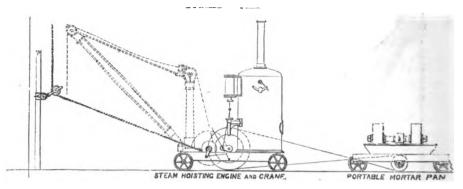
Elevation of No. 13 HOISTING ENGINE (or STEAM CRANE) with Patent Frictional Gearing, and Mortar Mill attached.
